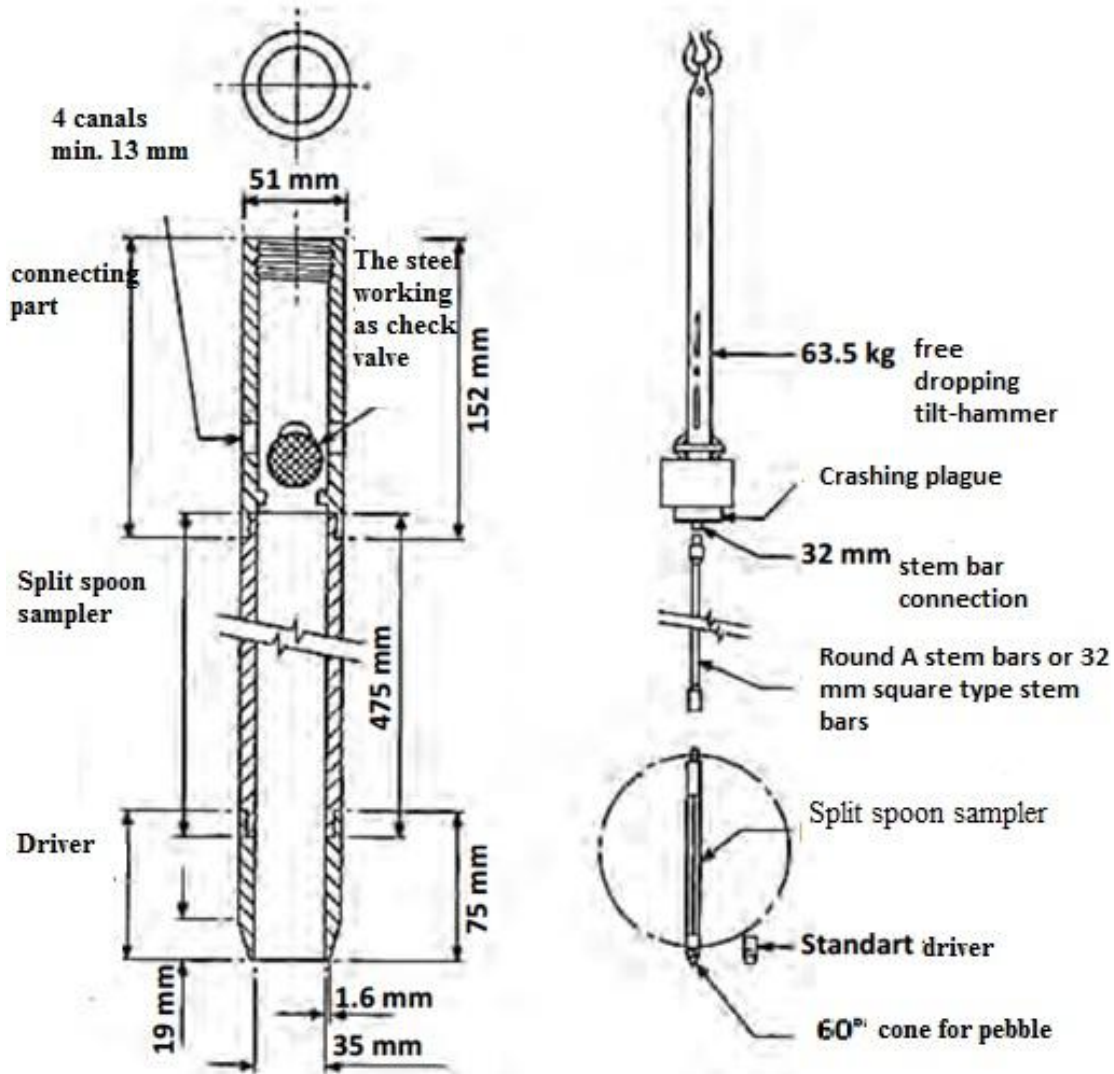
The Dimensions of Horizontally Cut Tubes (Clayton vd., 1995)
